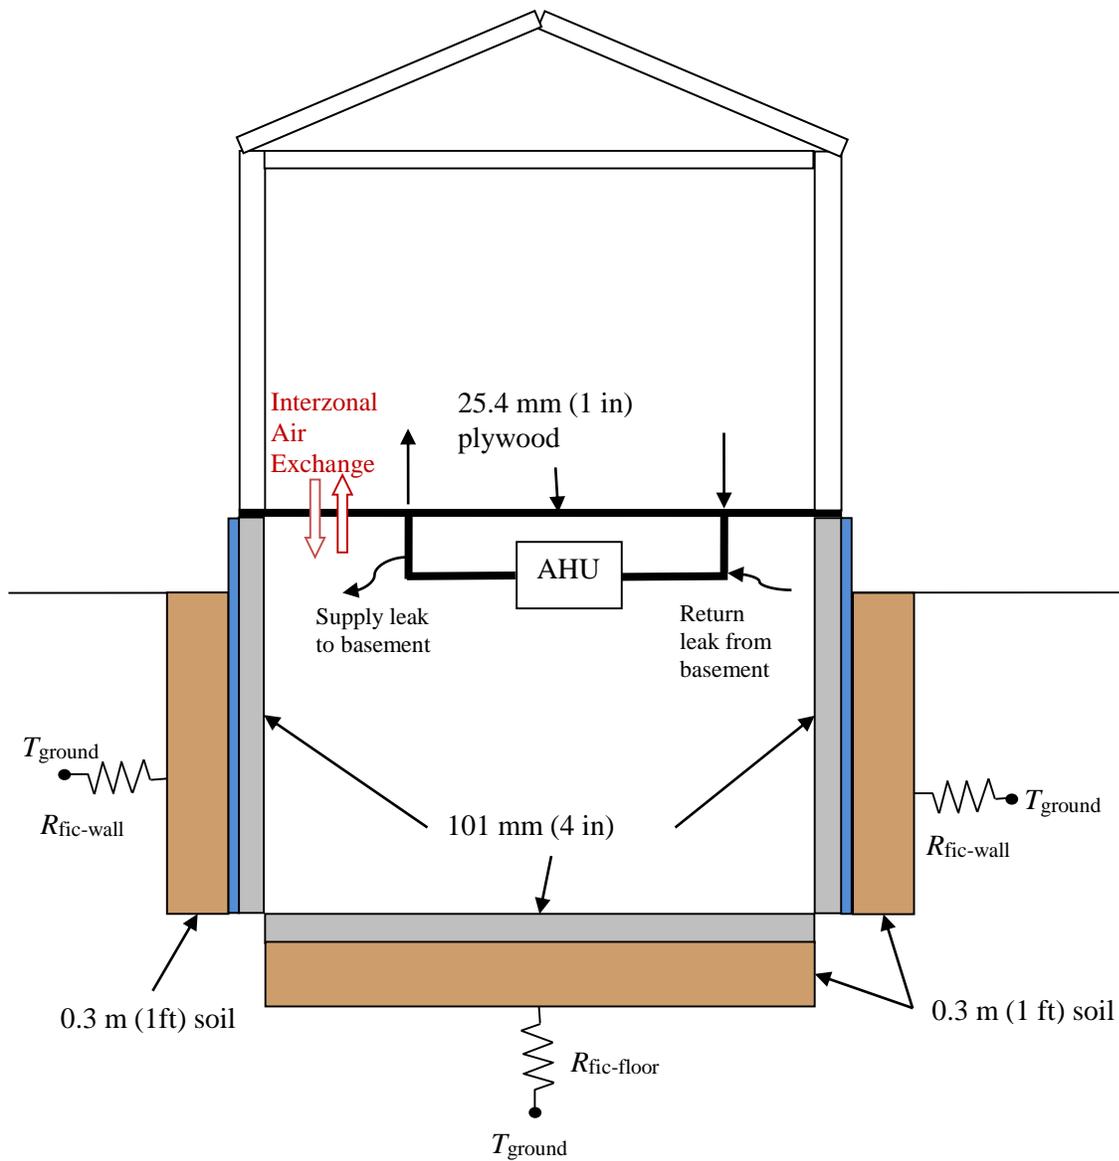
Schematic of a house with basement (ducts located in the semi-conditioned basement)
